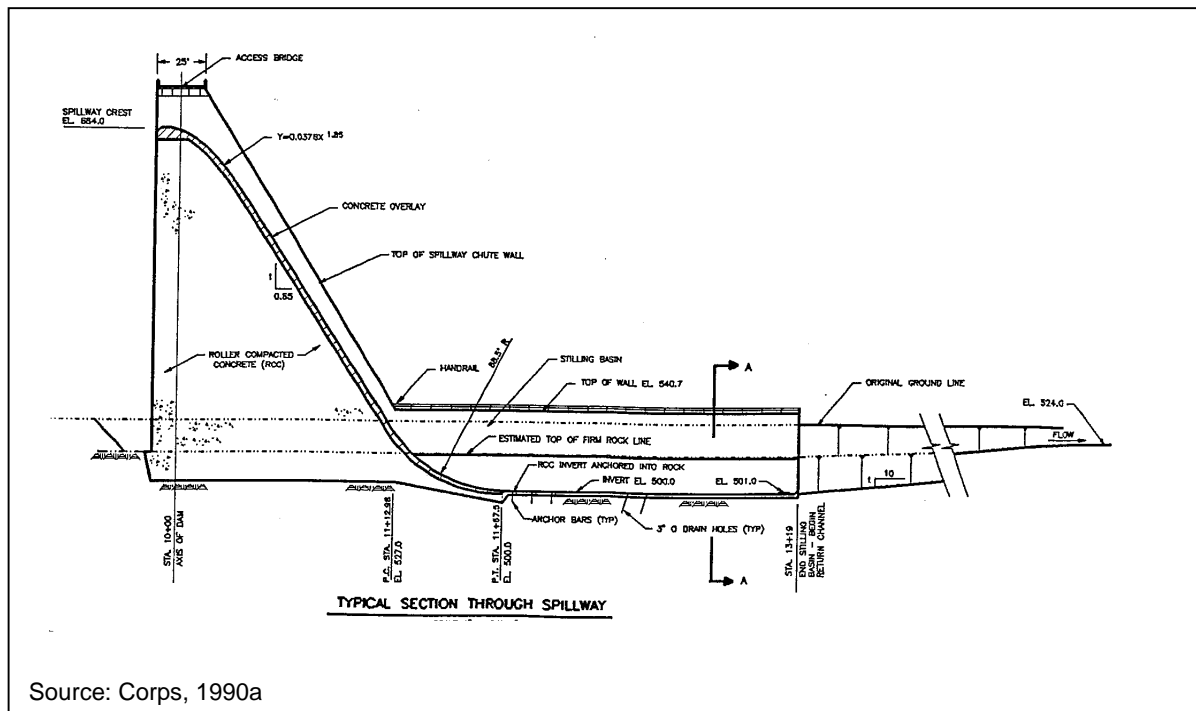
CROSS SECTION OF POTENTIAL DRY CREEK DAM
